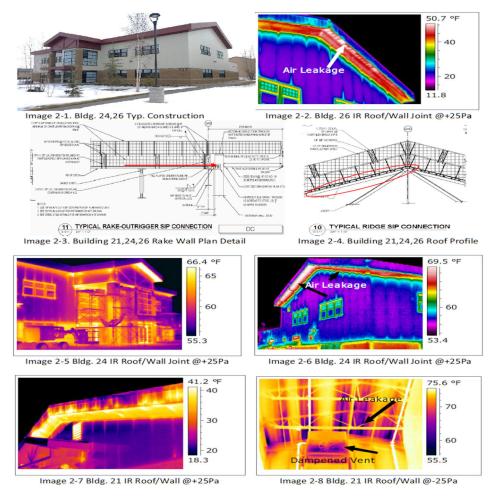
Failures and lessons learned; Bldgs. 21, 24, and 26, IR and plan details.
